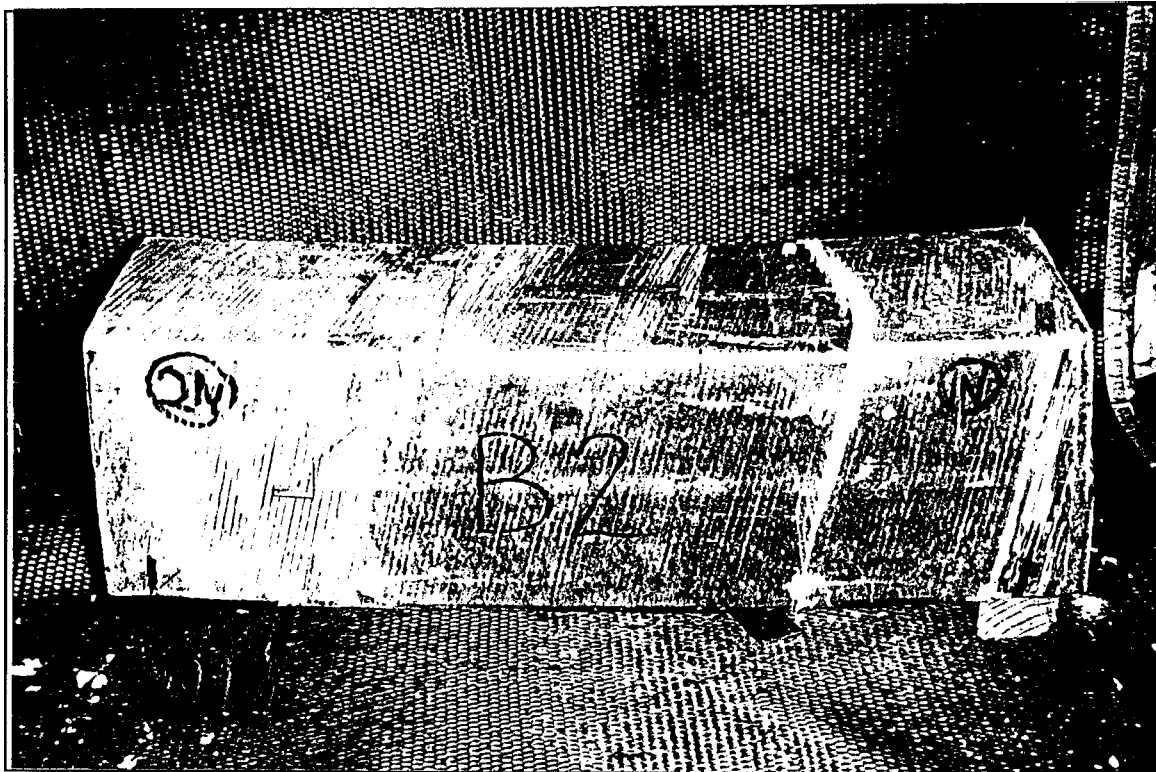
Beam B2 after failure showing crack inclination at fiber orientation -12-
